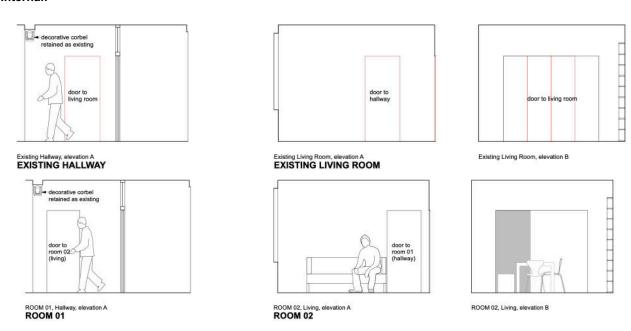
(above) – Existing interior elevations of the entrance hallway and living room.
